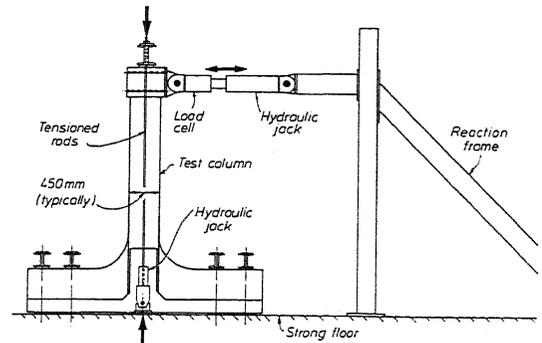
Loading arrangement for quasi-static cyclic lateral loading tests on column attached to laboratory strong floor.
